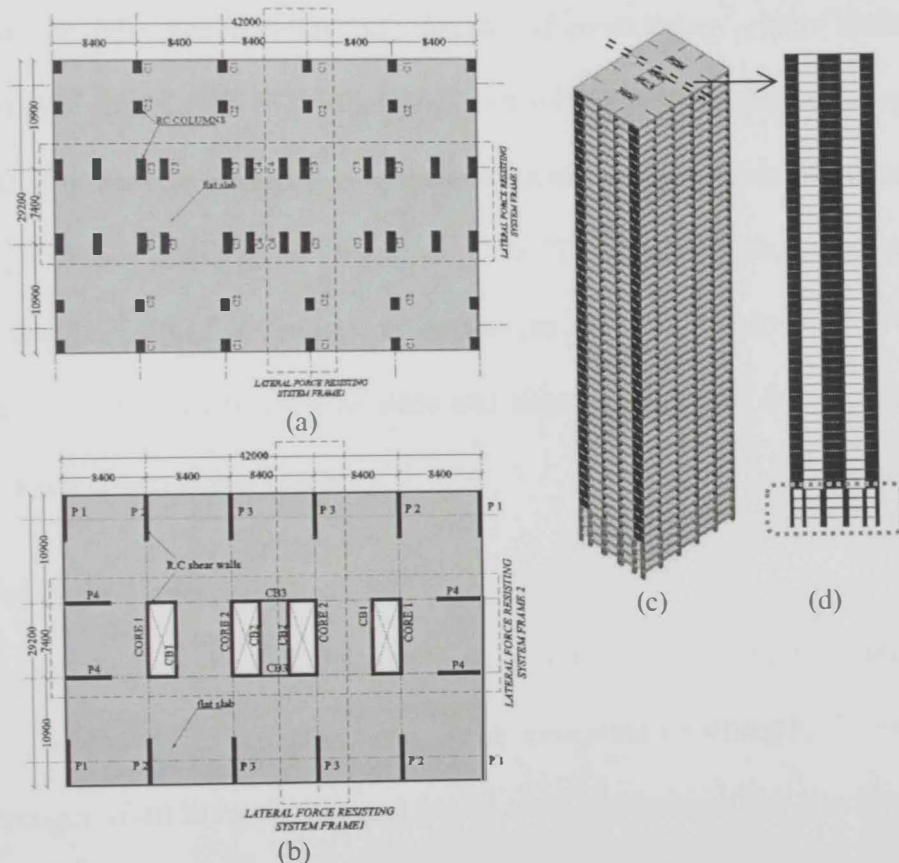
Reference structure B5-WST, (a) building layout at basement and ground stories, (b) building layout at typical stories (c), 3D view and (d) LFRS in transverse direction
